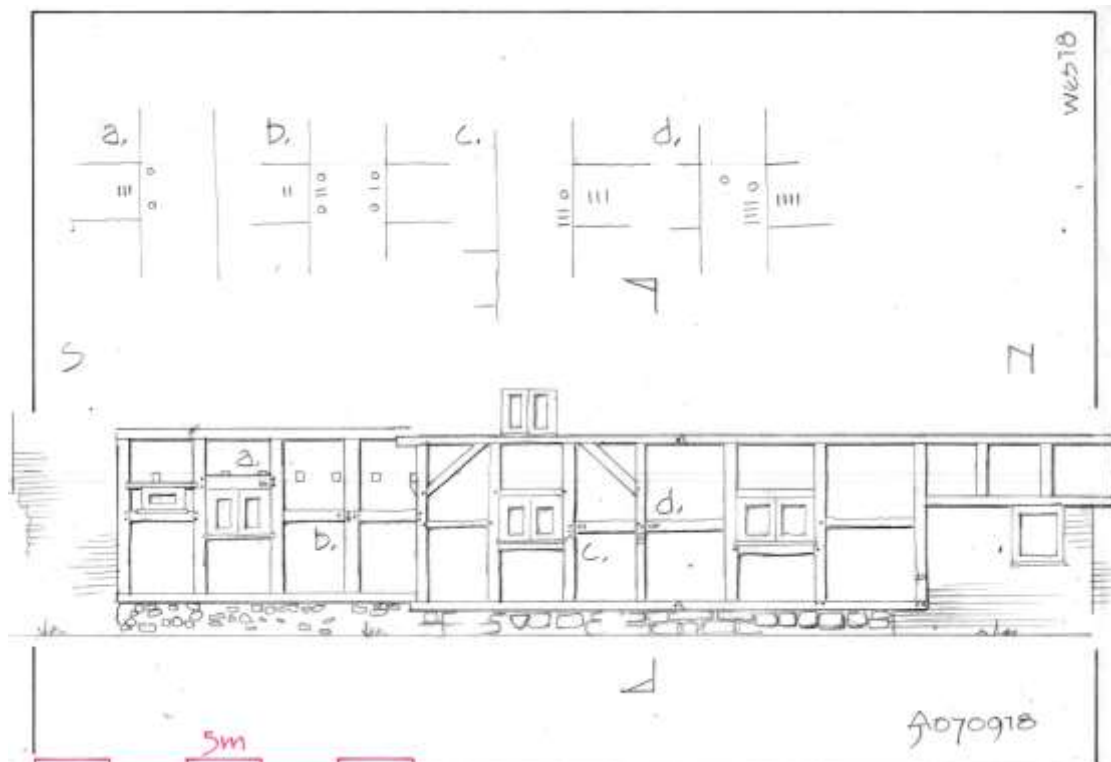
; east wall frame; showing original two-bay building and later additions north and south.
